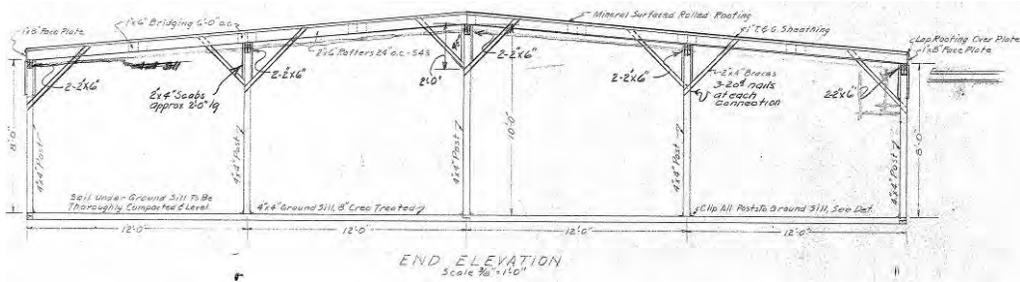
Open type shed (ready line and fitting), end elevation, Fort Bragg, NC, June 1949 (standard drawing 28-09-01 sheet 5 of 8; training aids, open type shed (ready line and fitting), Fort Bragg, NC; 6 June 1949).
